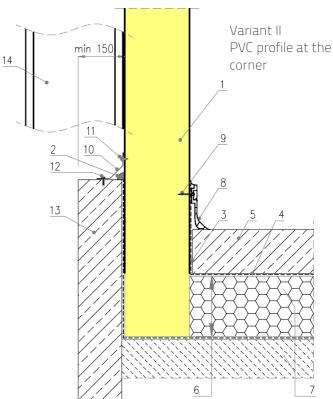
IzoCold PIR/PIR+ - joint of cold storage panels with concrete and PVC corner
